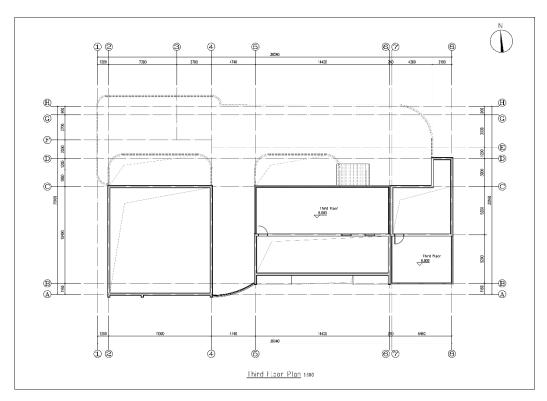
The Third Floor Plan of Building Complex (Drawn by the author)
